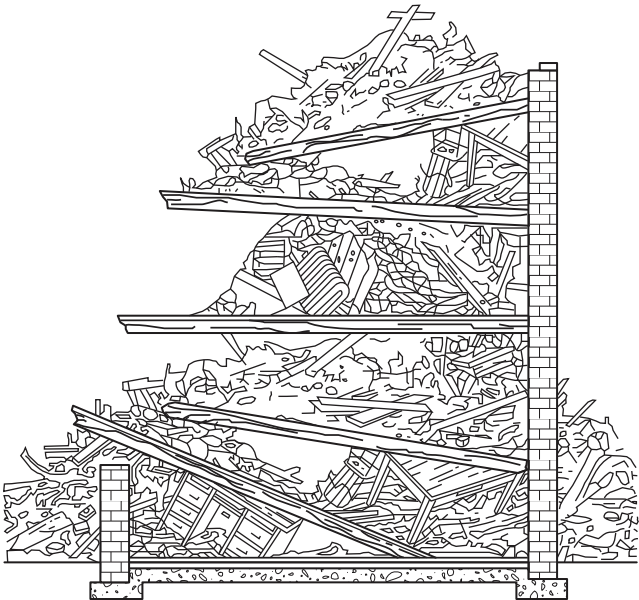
(d) Cantilever Floor Collapse. [Courtesy of Defense Civil Preparedness Agency (U.S. Department of Defense)]
